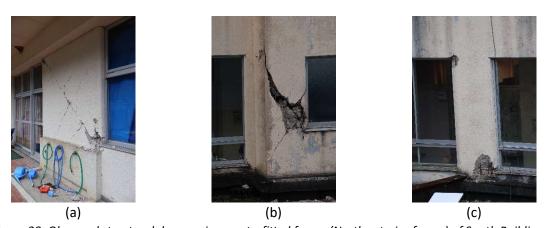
Observed structural damage in un-retrofitted frame (North exterior frame) of South Building in School S4: (a) Shear failure of walls in the first storey, (b) Shear failure of short-captive columns in the second storey, (c) Concrete spalling at the end region in columns in the second storey
